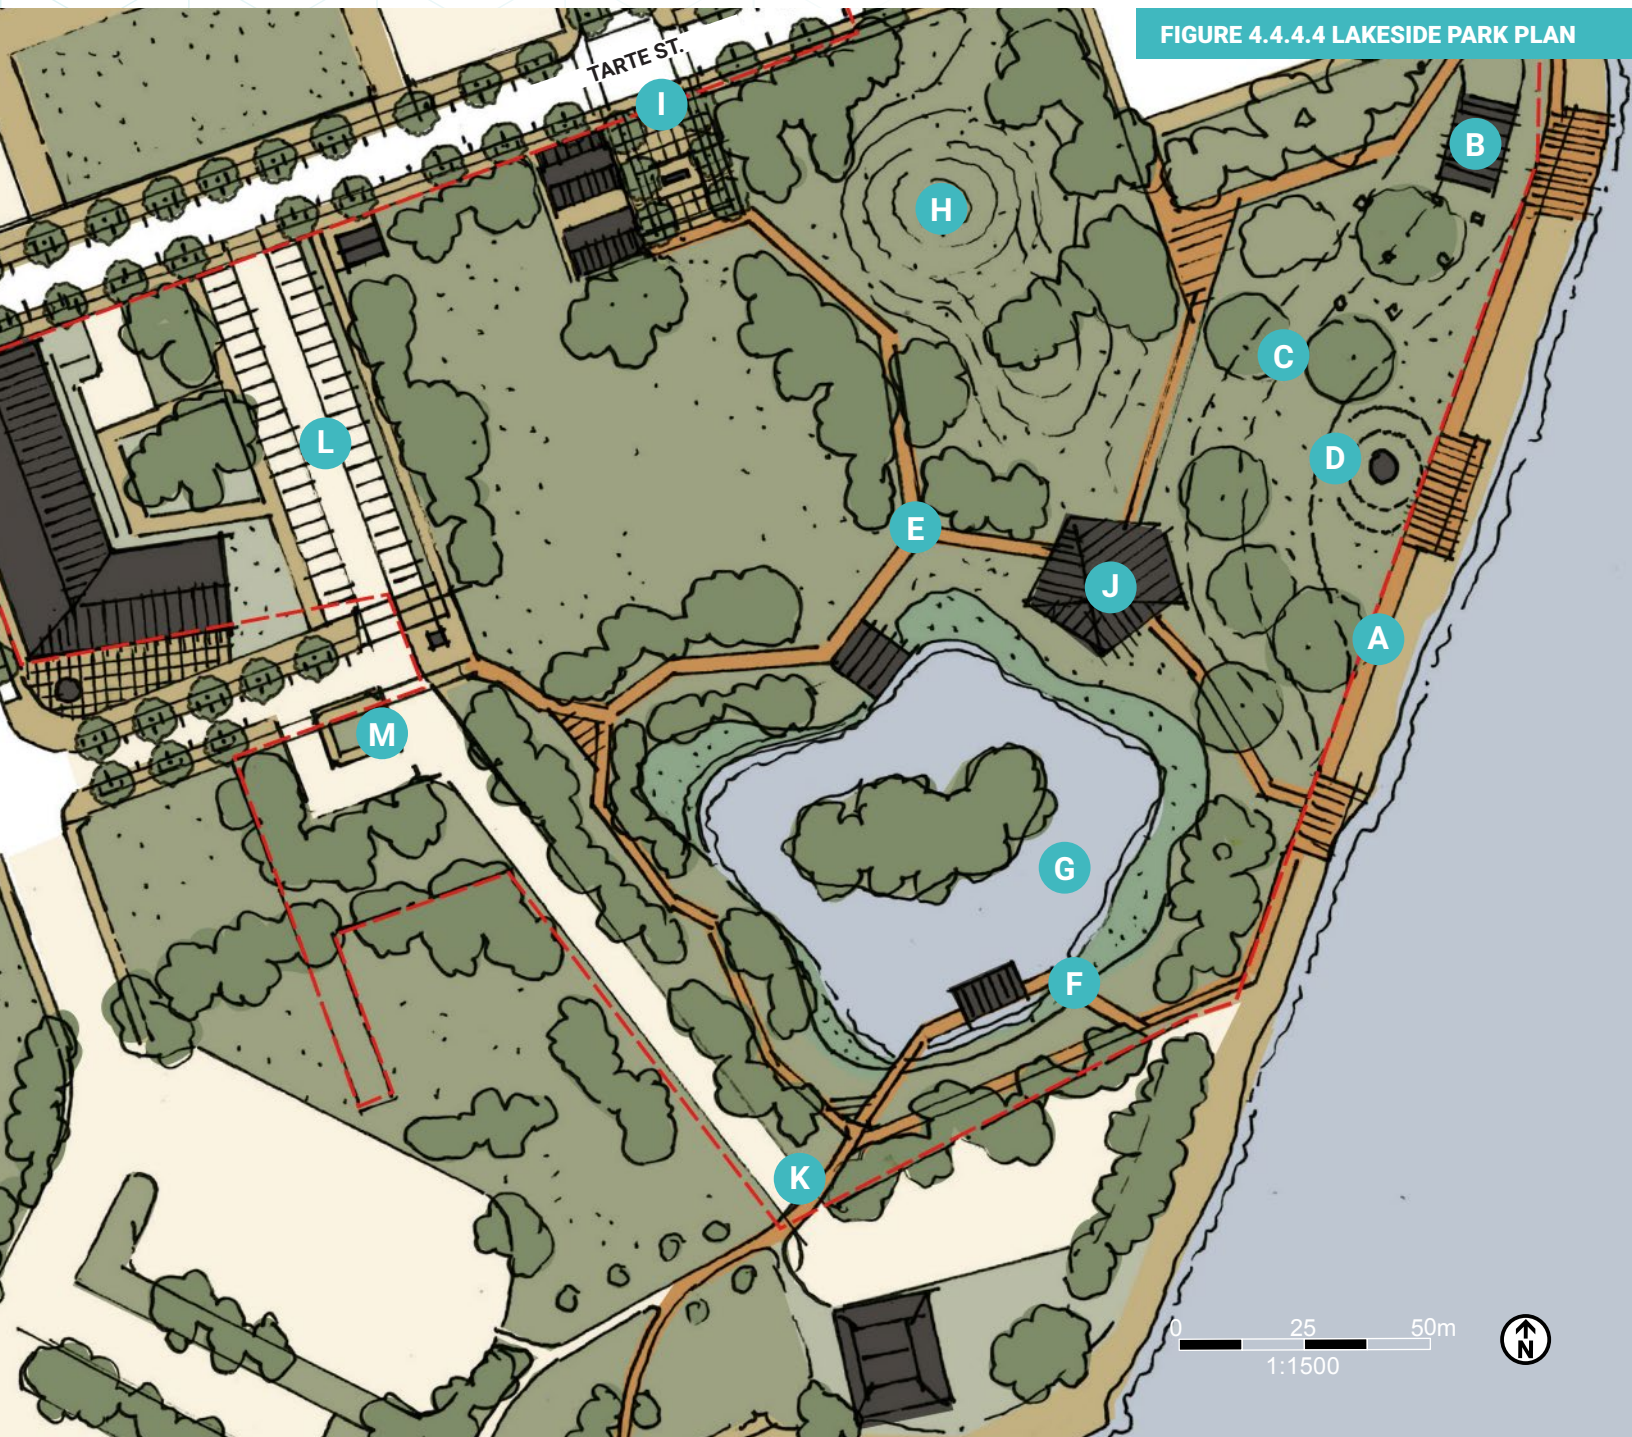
LAKESIDE PARK PLAN
